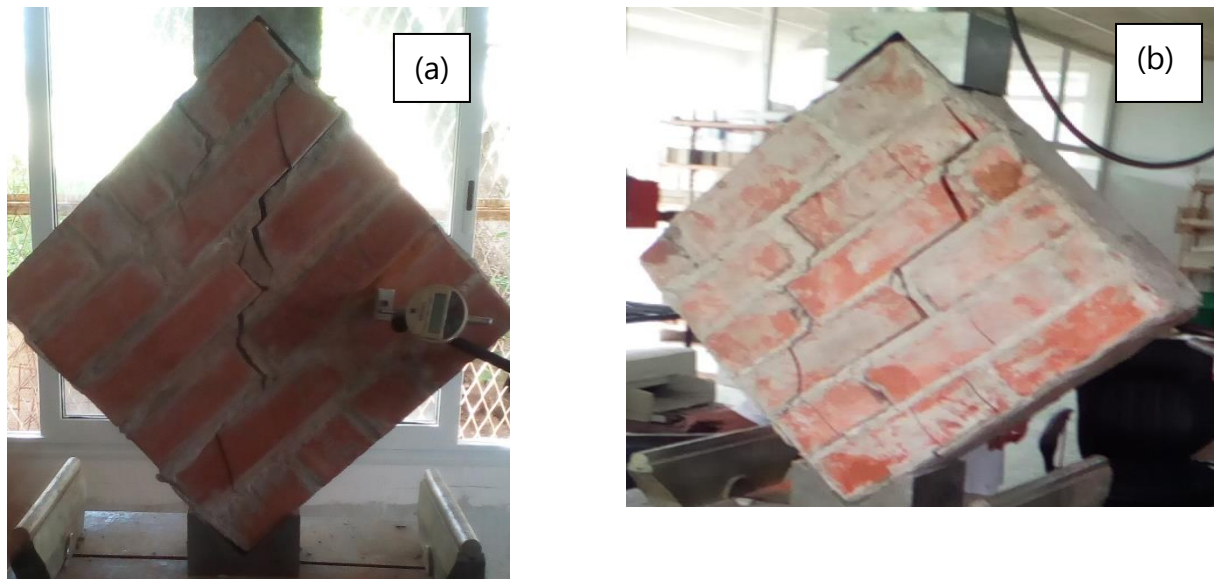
Failure modes of control masonry panels: (a) MTA, (b) MTB
